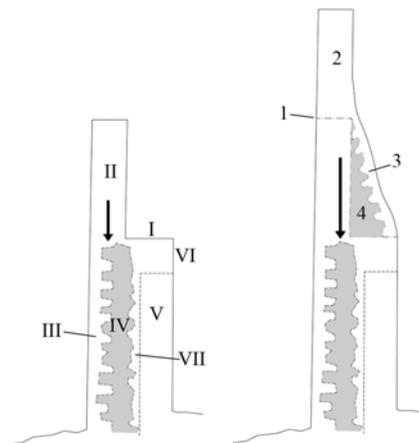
Simplified sections of the land wall. The section to the left shows the land wall before it was heightened and the section to the right shows it after the heightening and the structure today. The arrows show the eccentric loading of the outer leaf. I) Rampart walk. II) Parapet. III) Outer masonry leaf. IV) Core with clay mortar and no bond. V) Openings of inside arches. VI) Top of inside arches. VII) Thin masonry leaf inside arches. 1) The height of the original wall (left image). 2) Heightening of the wall in solid masonry. 3) Masonry leaf of bottleneck-shaped masonry. 4) Upper core inside former parapet wall.
